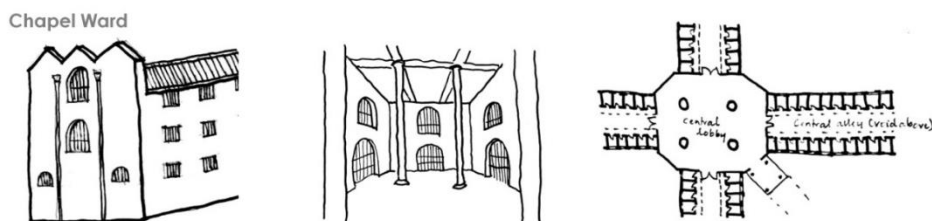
Welikada Prison: Chapel ward- Triple gable roof, Atrium and Cruciform layout [Sketch] (Source: Author)
